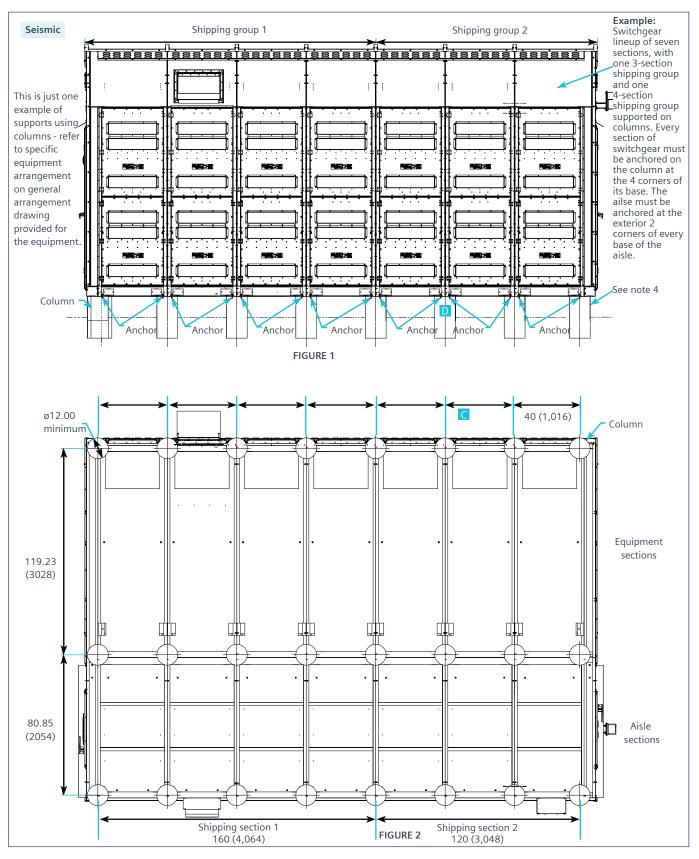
Anchoring outdoor type SGM-SG-AR Shelter-Clad single-aisle switchgear rated 27kV (continued)
